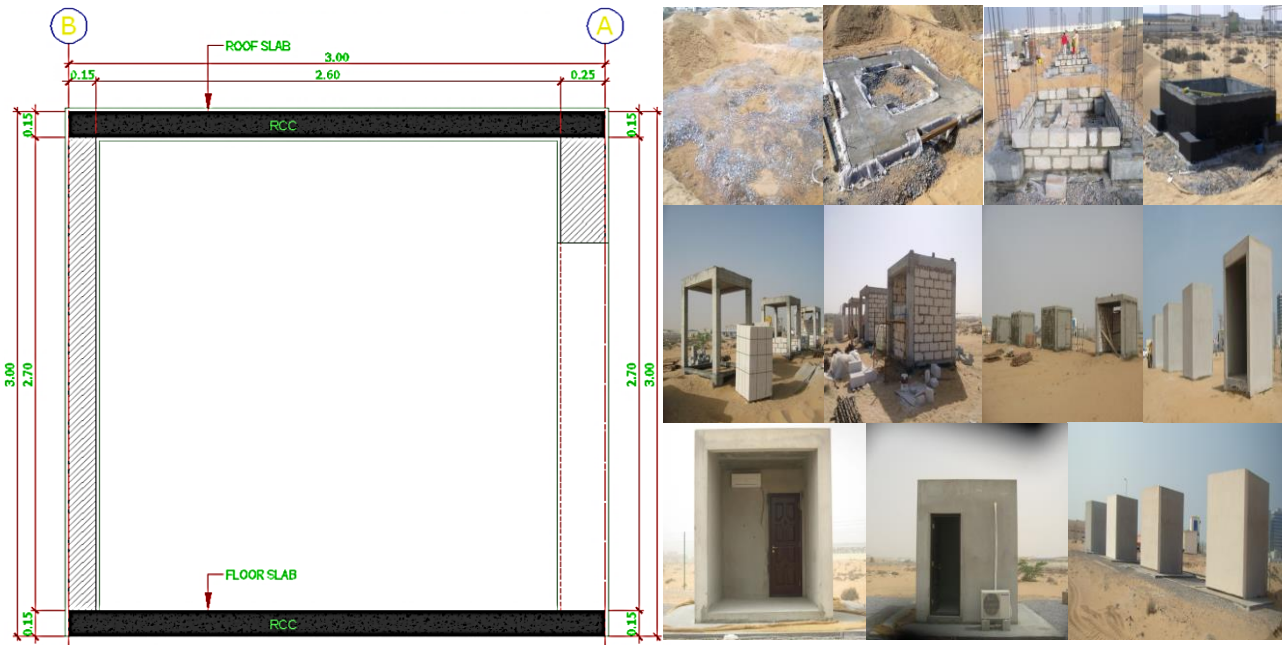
and Fig.3. Dimension of calorimeter in meters (m) and the construction of calorimeter with different south wall configuration [65]
